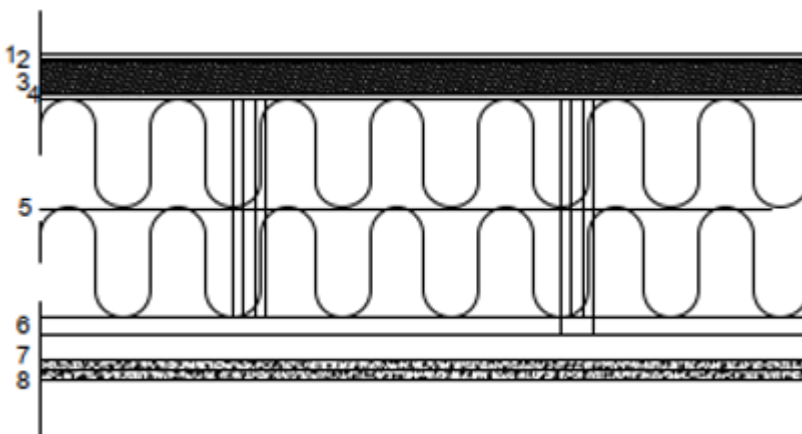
Reference floor 8. Diagram drawn in accordance with the floor type used in Chung et al. study.
